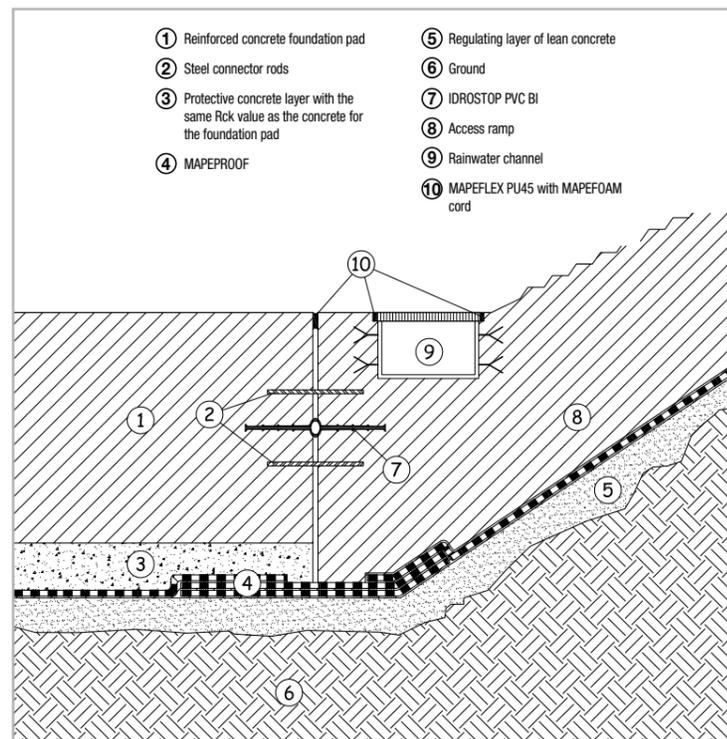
Detailed layout of waterproofing an access ramp to an underground garage which is structurally independent from the rest of the building
